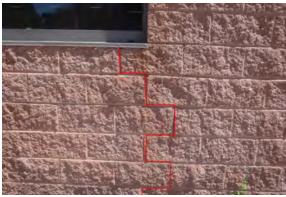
Cracking below window frame corner at southwest elevation
